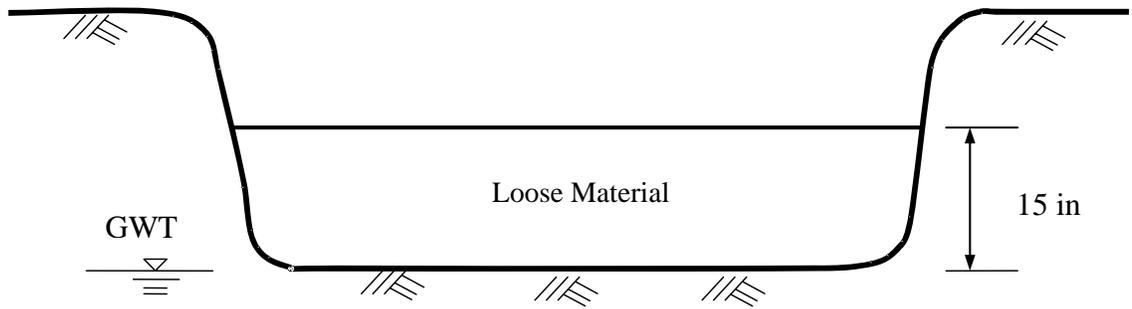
Schematic Site Plan for Compaction of Case A5 (Lake Worth Site)
